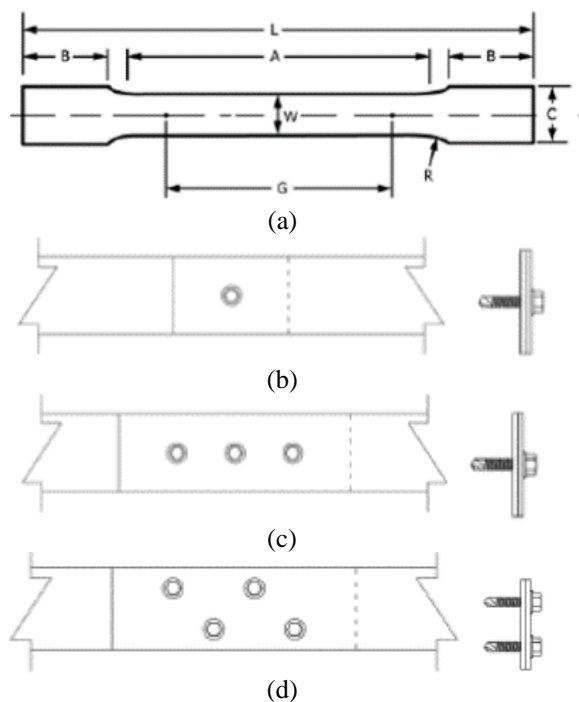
Configuration and assembly of test specimen; (a) without connection, (b) 1 screw, (c) 3 screws, and (d) 4 screws.
